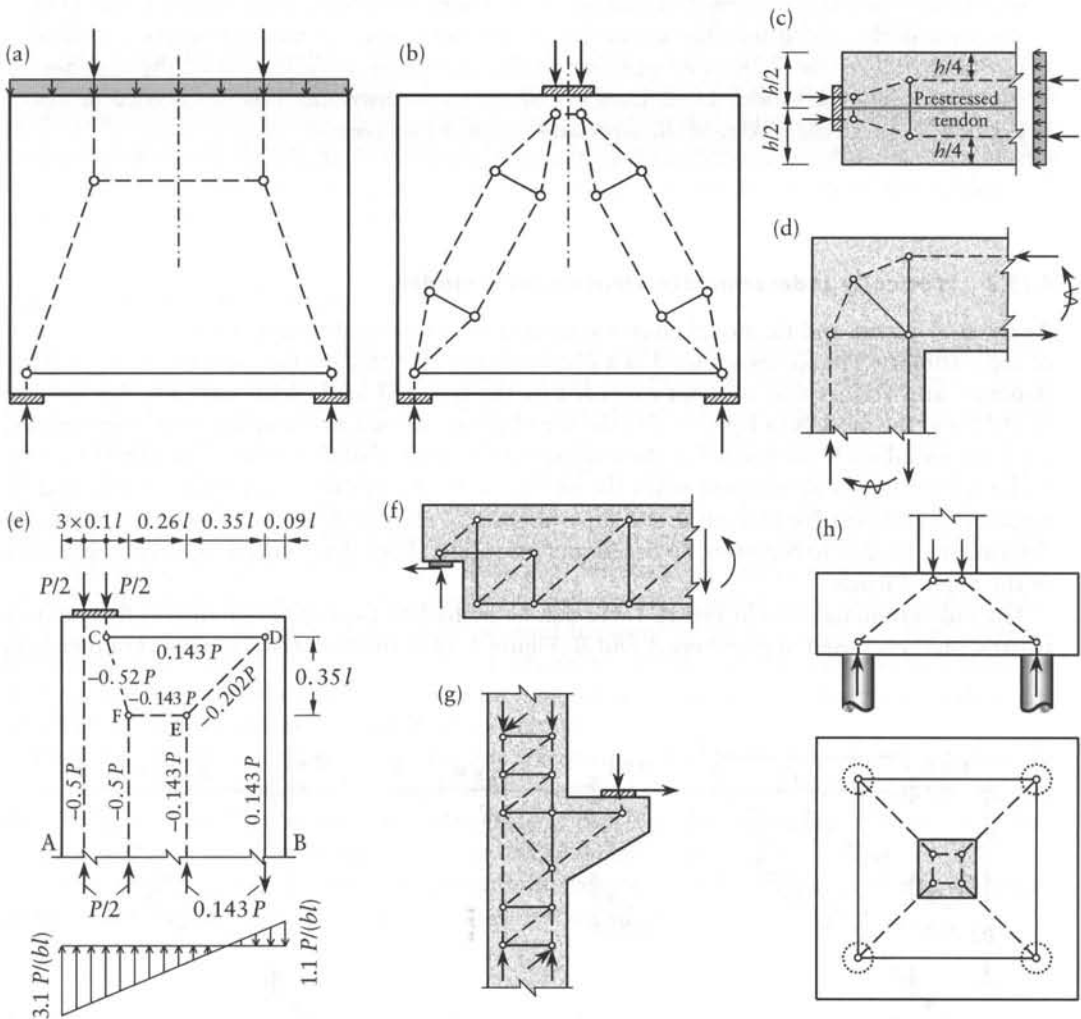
Strut-and-tie model applications for: (a) and (b) wall carrying uniform or concentrated load; (c) anchorage of a prestressing tendon; (d) connection of a column with a beam; (e) tall wall supporting a column; (f) sudden change in depth of a beam adjacent to its support; (g) corbel; (h) spatial strut-and-tie model for a pile cap.
